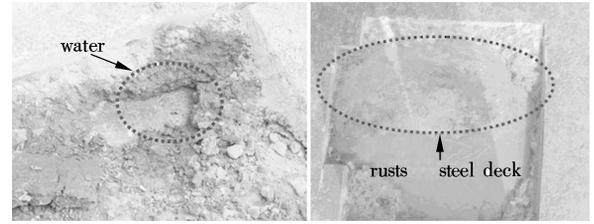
Water remaining in the pavement and rust of the steel deck on NSYSB
